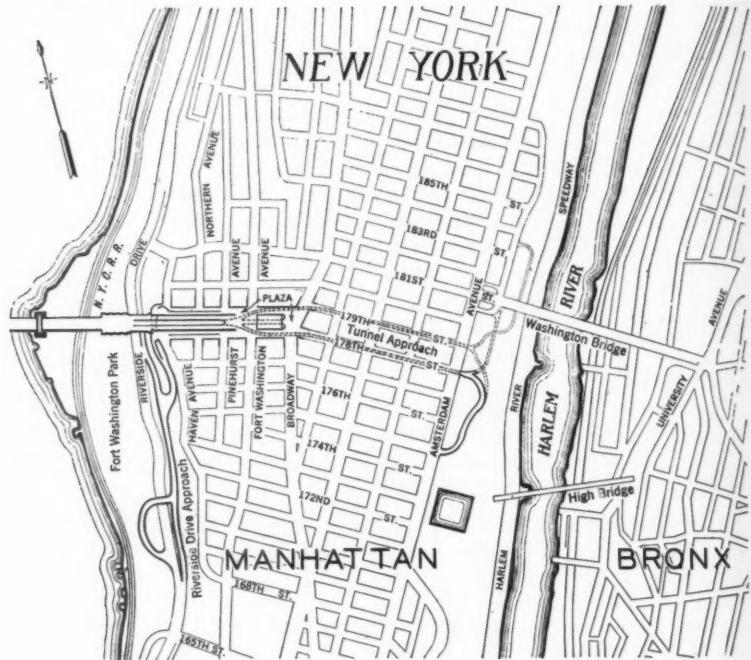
GENERAL PLAN OF NEW YORK APPROACH AND CONNECTIONS.
